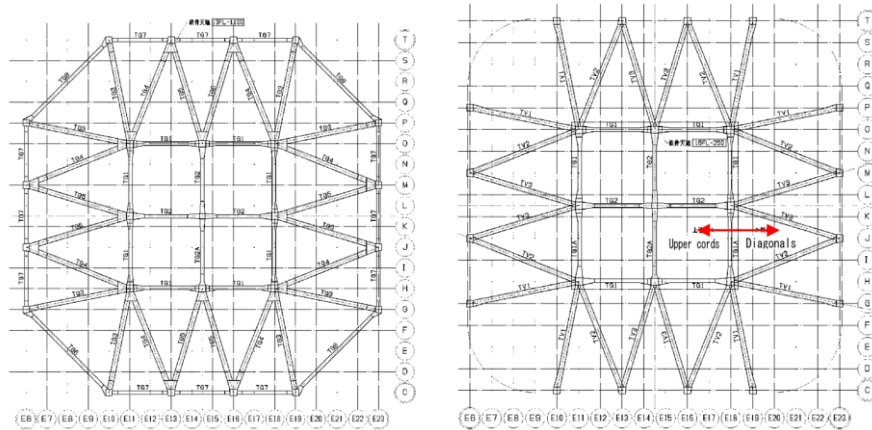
(a) 13<sup>th</sup> floor framing plan, (b) 15<sup>th</sup> floor framing plan
